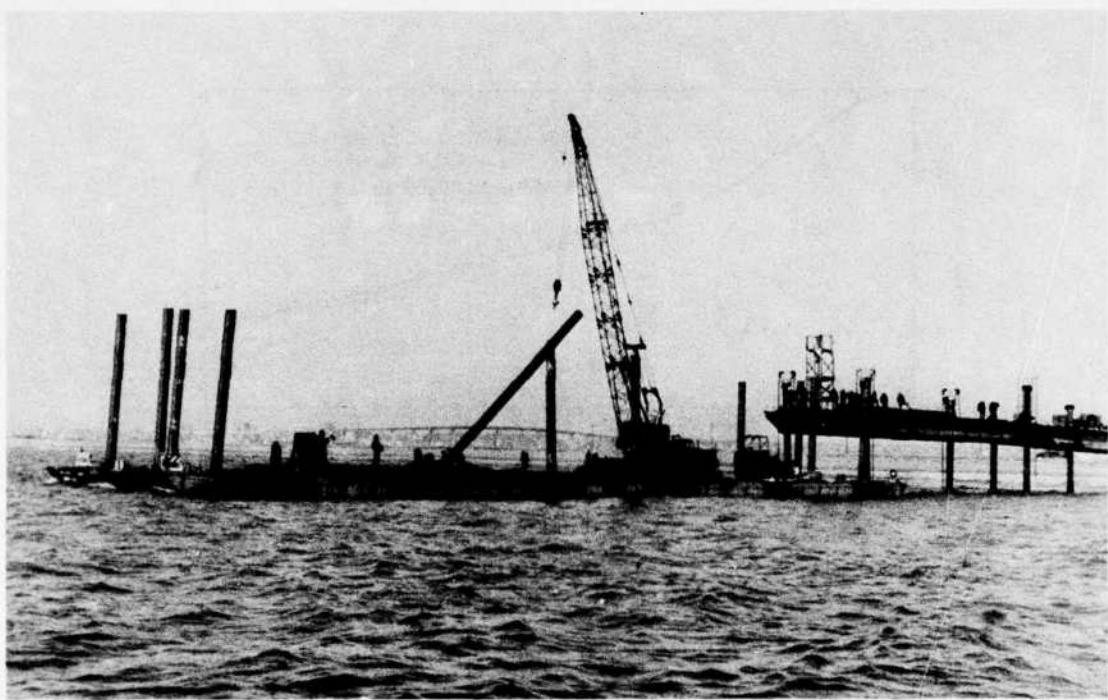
Hydraulic jacks lifting causeway section while piles are being placed in following sections.
